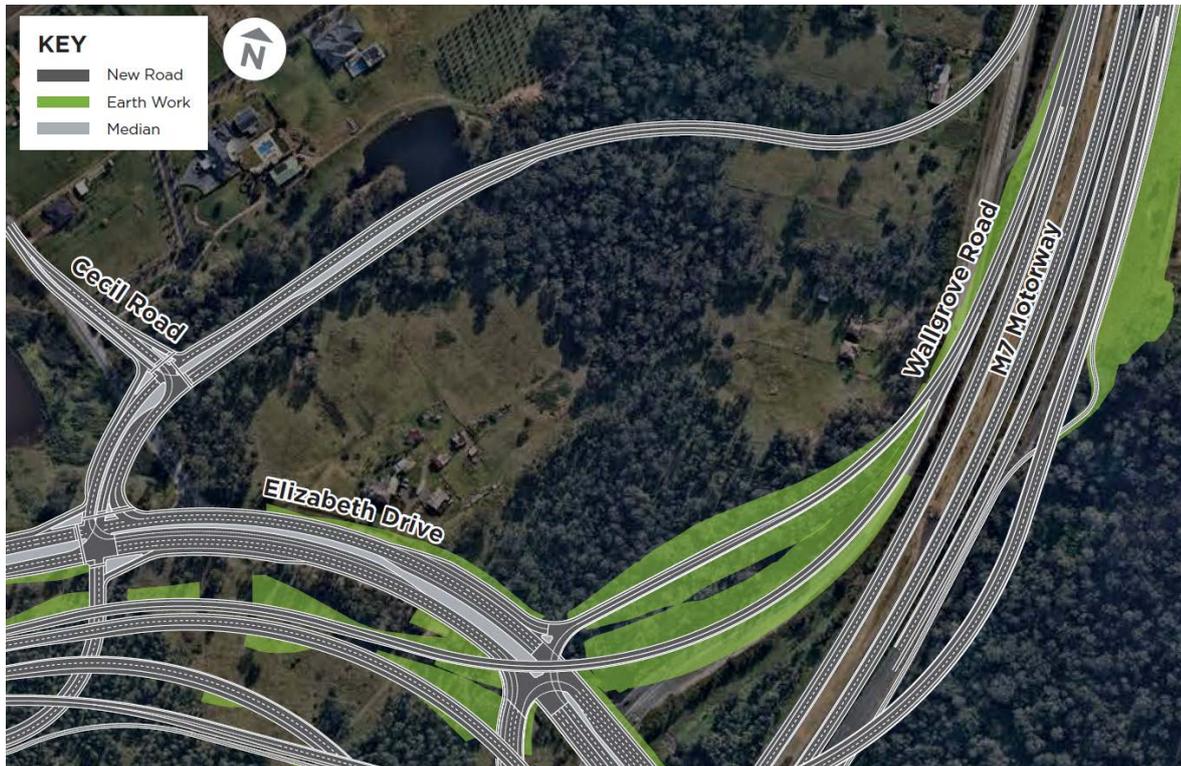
Option C - Signalled intersection Cecil Road / Wallgrove Road and Elizabeth Drive intersection shifted west
